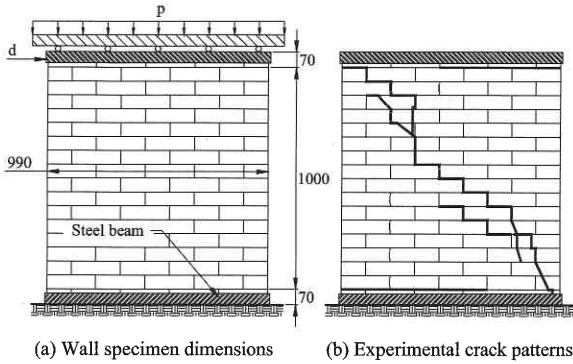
Masonry wall dimensions (in mm) and crack pattern<sup>8)</sup>
